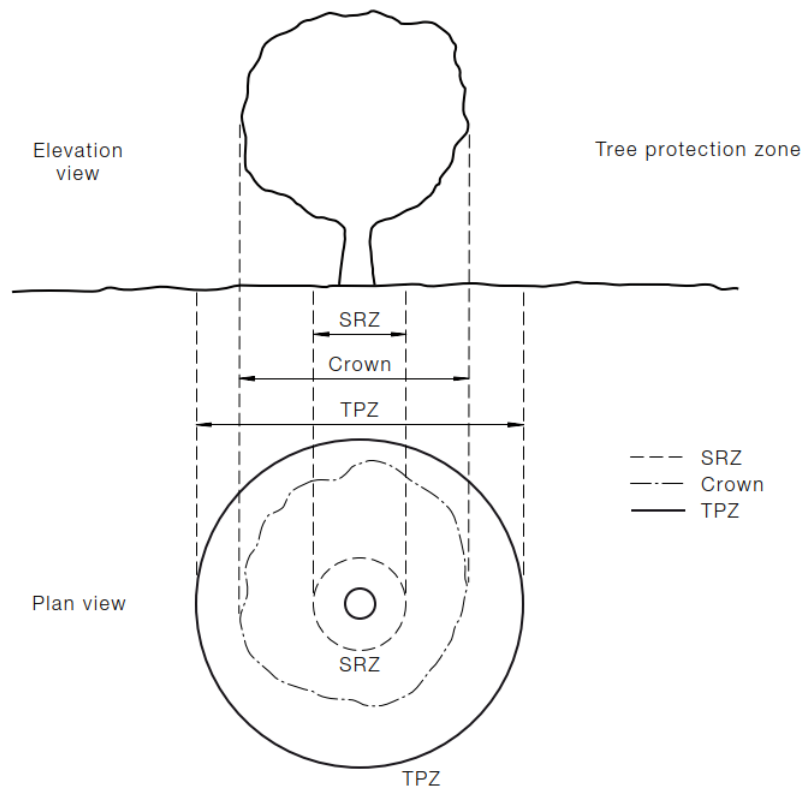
Tree Protection Zone and Structural Root Zone – extract from AS 4970:2009
